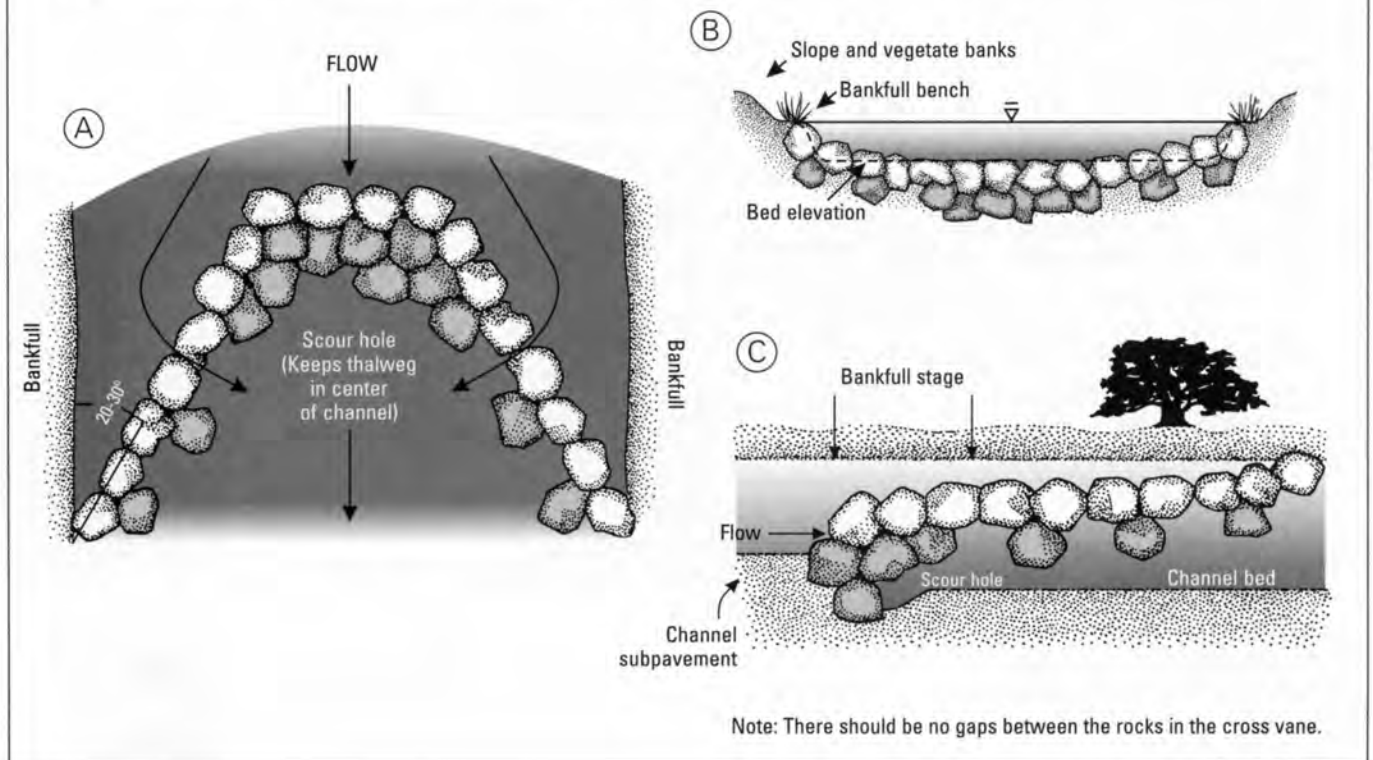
(a) Plan view, (b) cross-section, and (c) profile views of cross vane.
